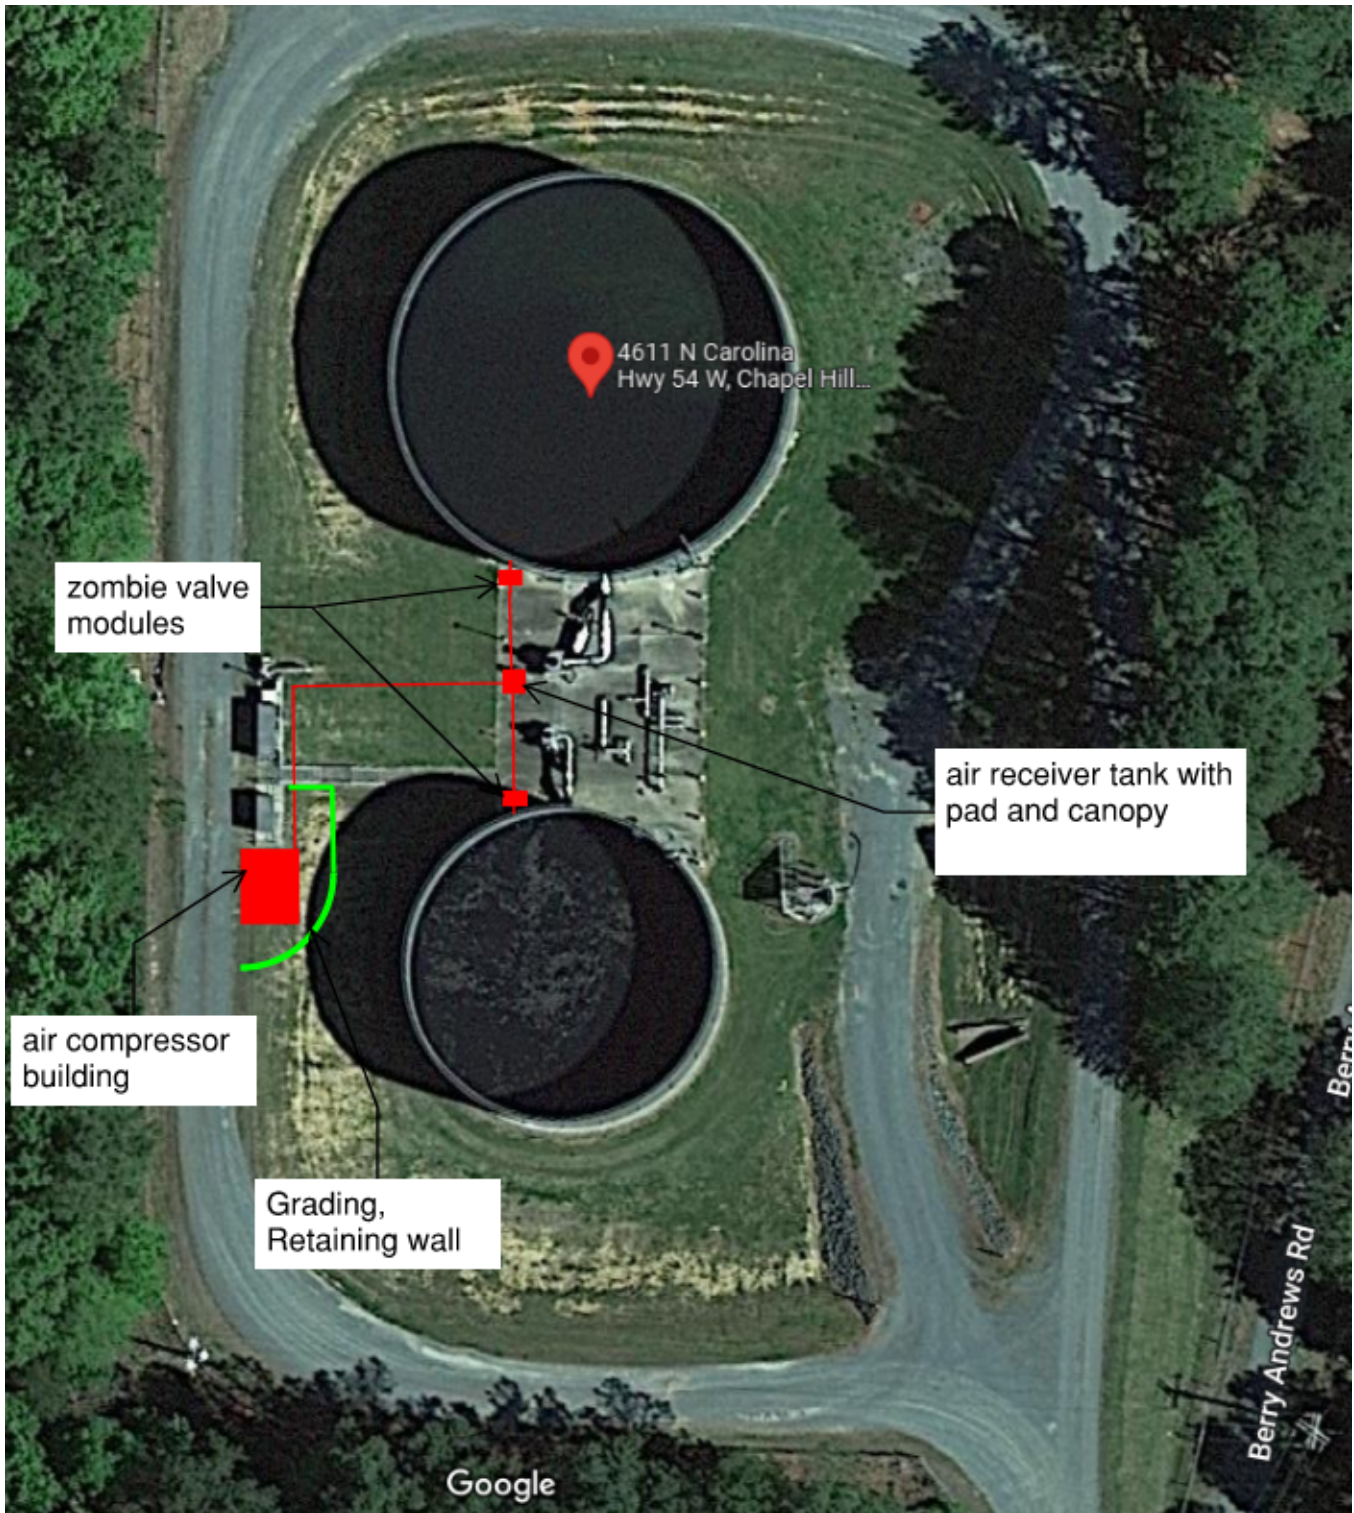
Large Bubble Mixing Conceptual Design- Equipment Layout at Off-site
